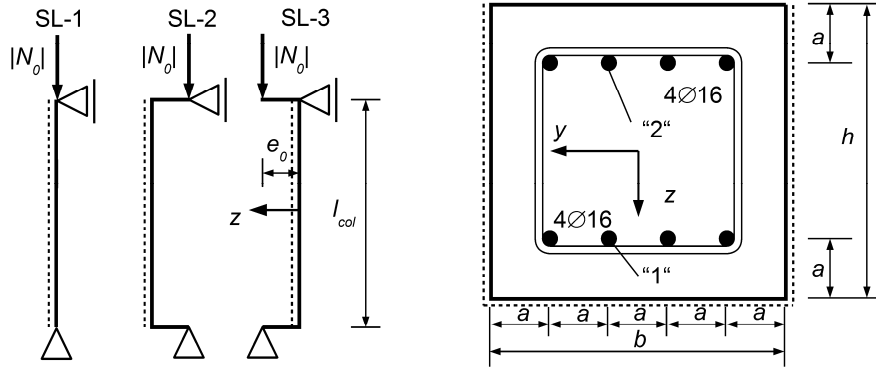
Structural system and cross section for the laboratory tests by Anderberg
